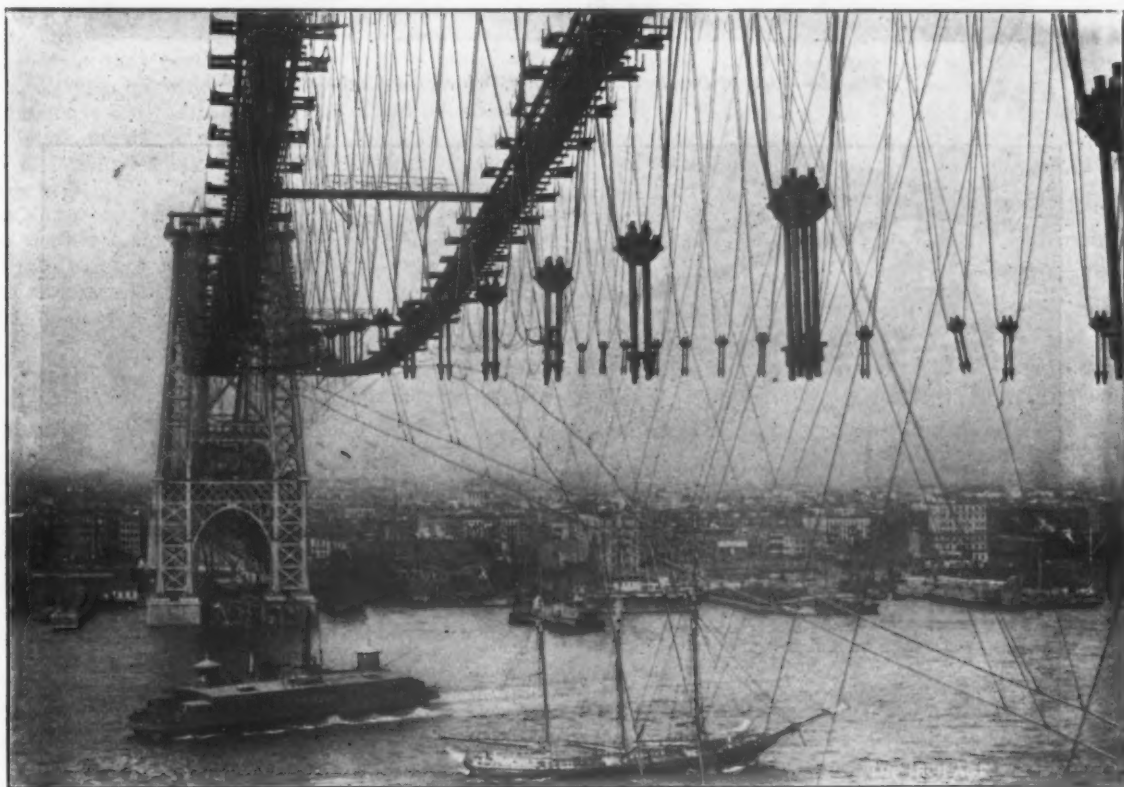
Looking Toward New York Tower Just Before Fire.
